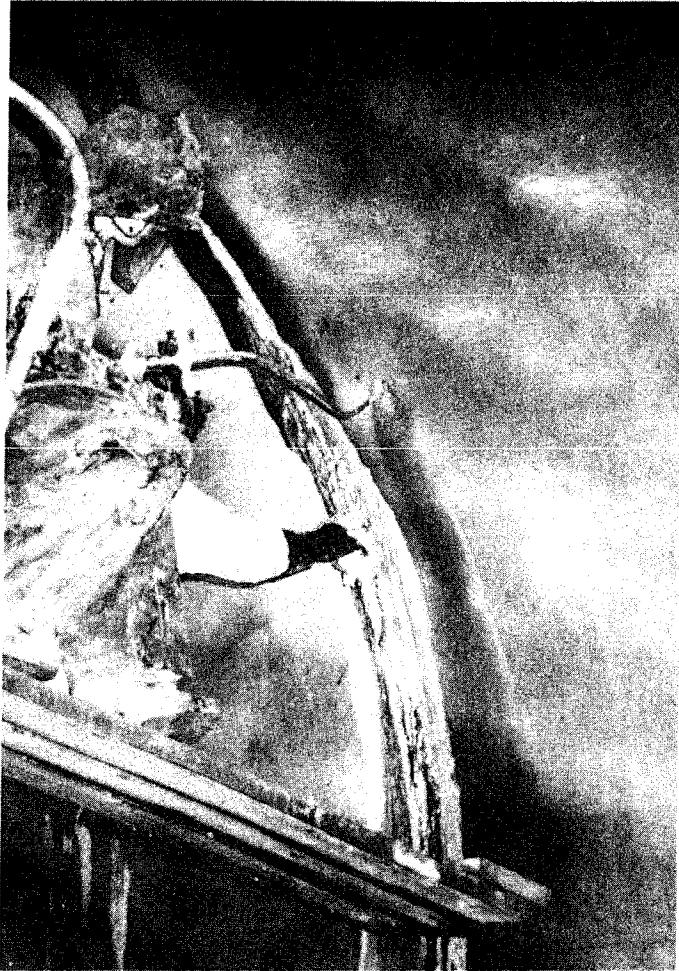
Injection of monolith joint 4/5 with chemical grout leaking out of joint, Blakely Mountain Dam, 1986
